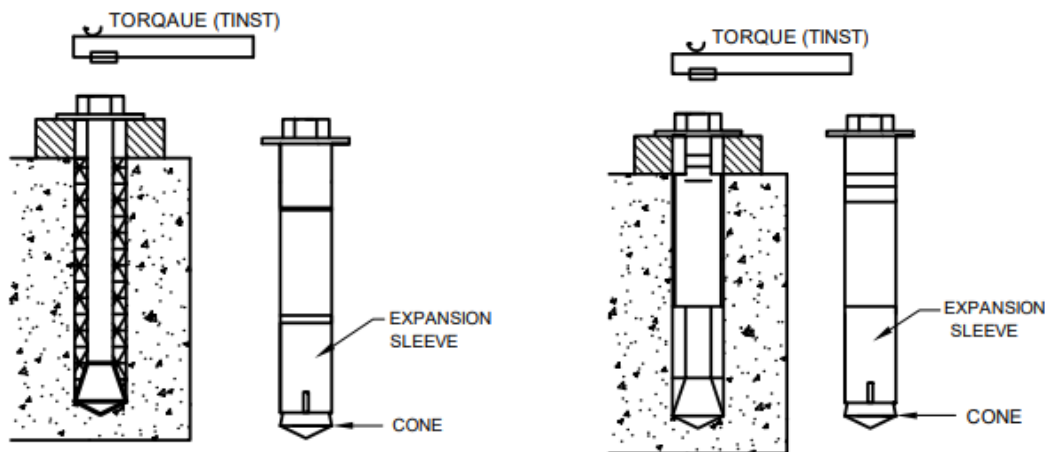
TYPICAL TORQUE-CONTROLLED ADHESIVE ANCHOR
